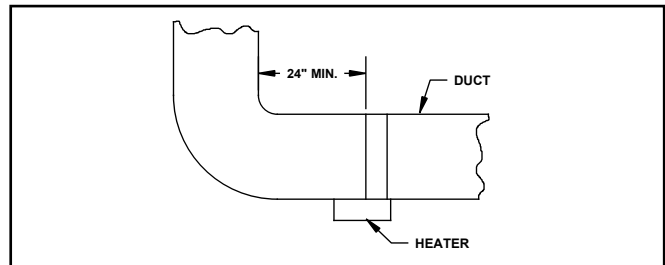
PLACEMENT: ELBOW MINIMUM REQUIREMENT
